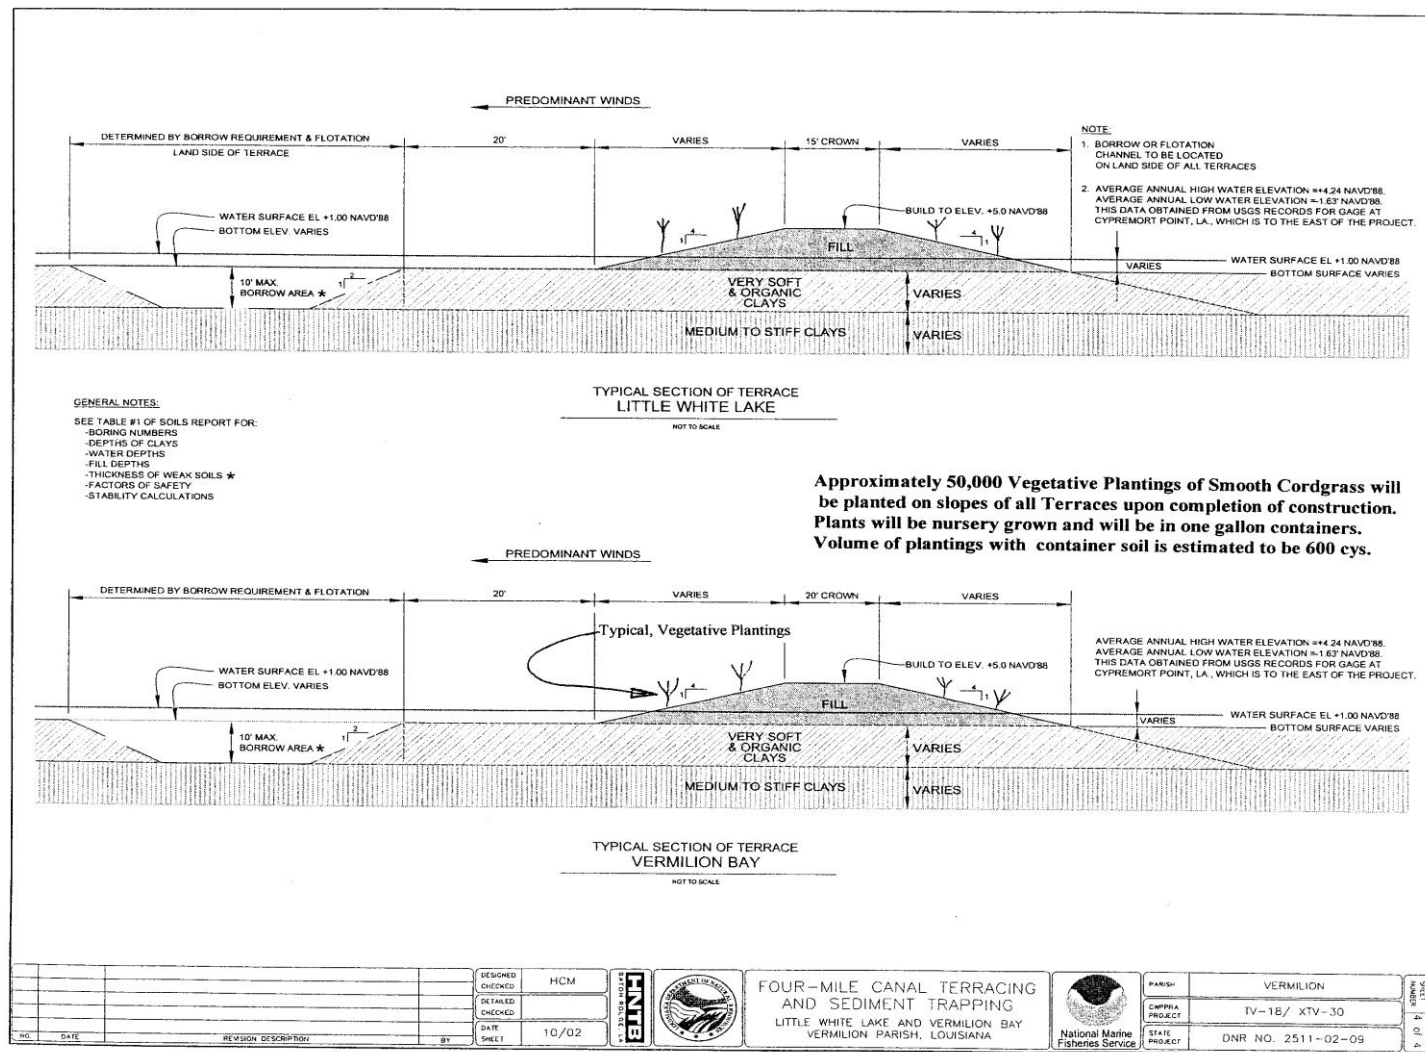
Typical layout and cross section of proposed terraces to be constructed in Little Vermilion Bay and Little White Lake for the Four-Mile Canal Terracing and Sediment Trapping (TV-18) project (HNTB 2002).
